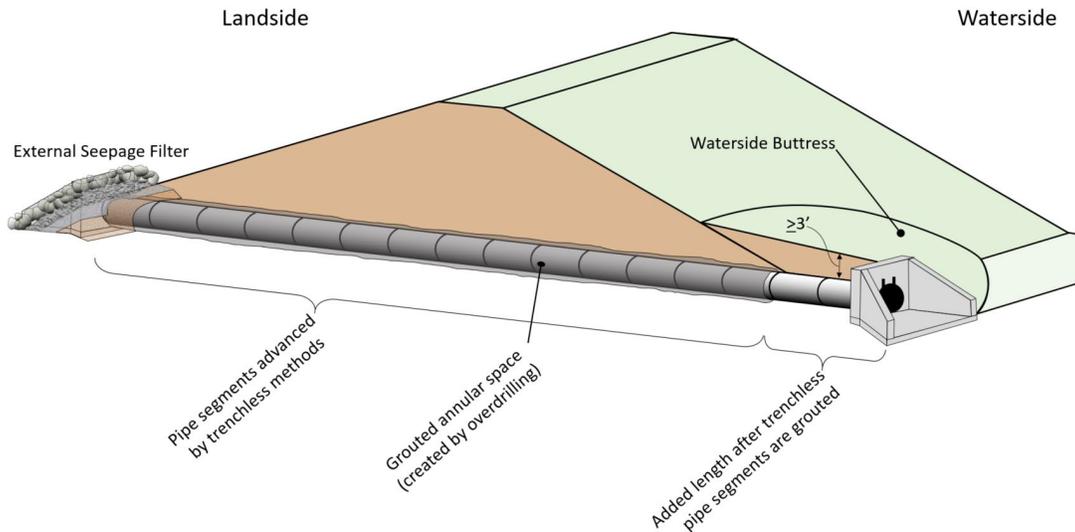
Waterside buttress required for trenchless pipe installation within embankment.
